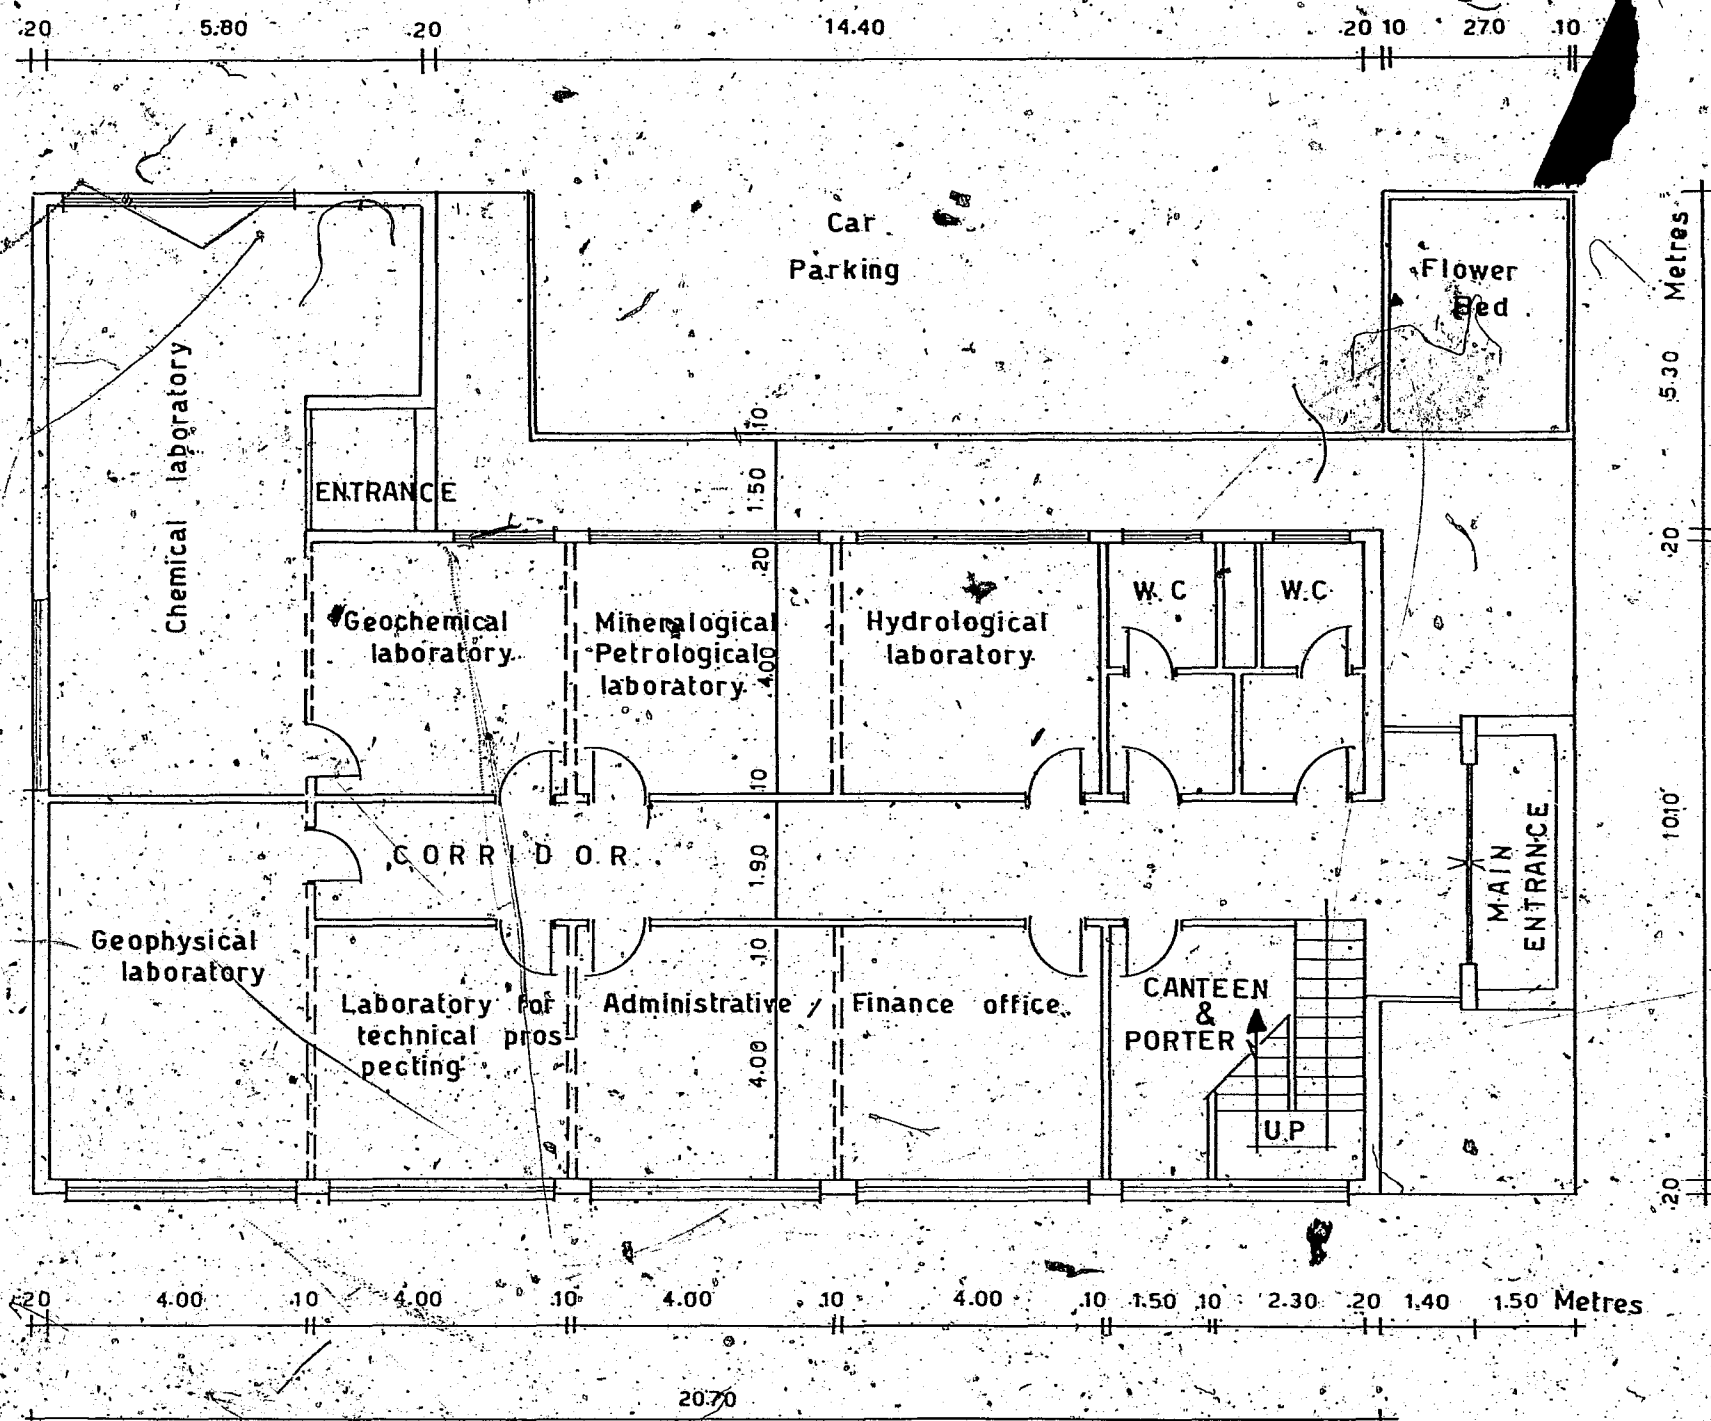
Somali Geological Survey Building, Mogadiscio: Ground floor plan
